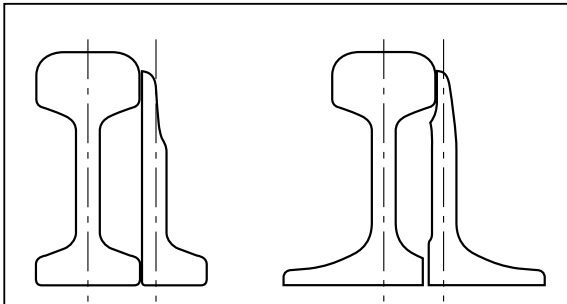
End views of straight-cut Bull head and flat bottomed switches.
